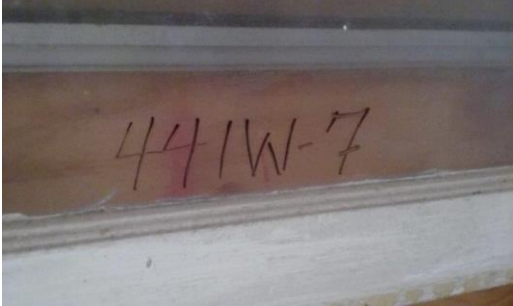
Window Glazing (441W-7) Dining Room, Wall B. 2% Chrysotile Asbestos Detected (PC=1.0%).
